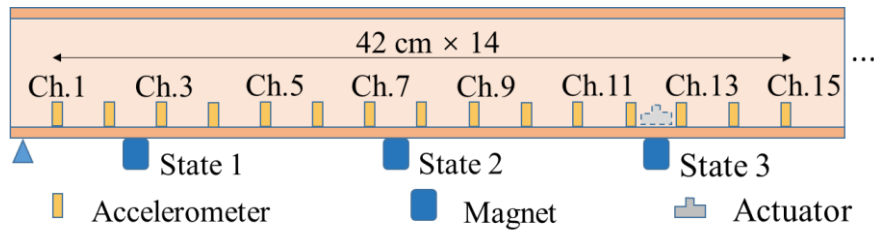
Layout of the long steel girder bridge vibration experiment
